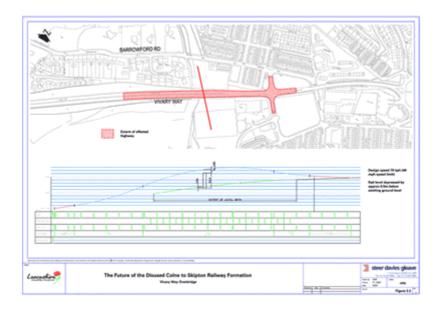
VIVARY WAY OVERBRIDGE
